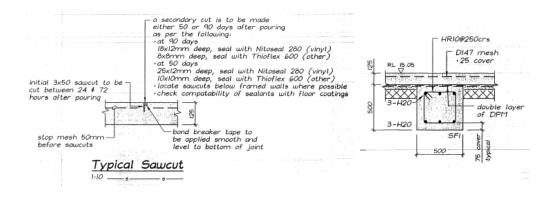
S.O.G. Construction Joint and Tie Beam Details
